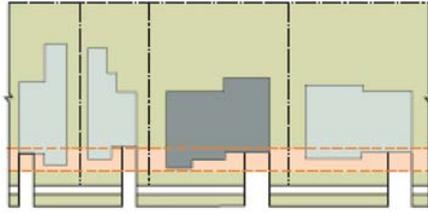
street setbacks located within a range defined by existing building setbacks.
